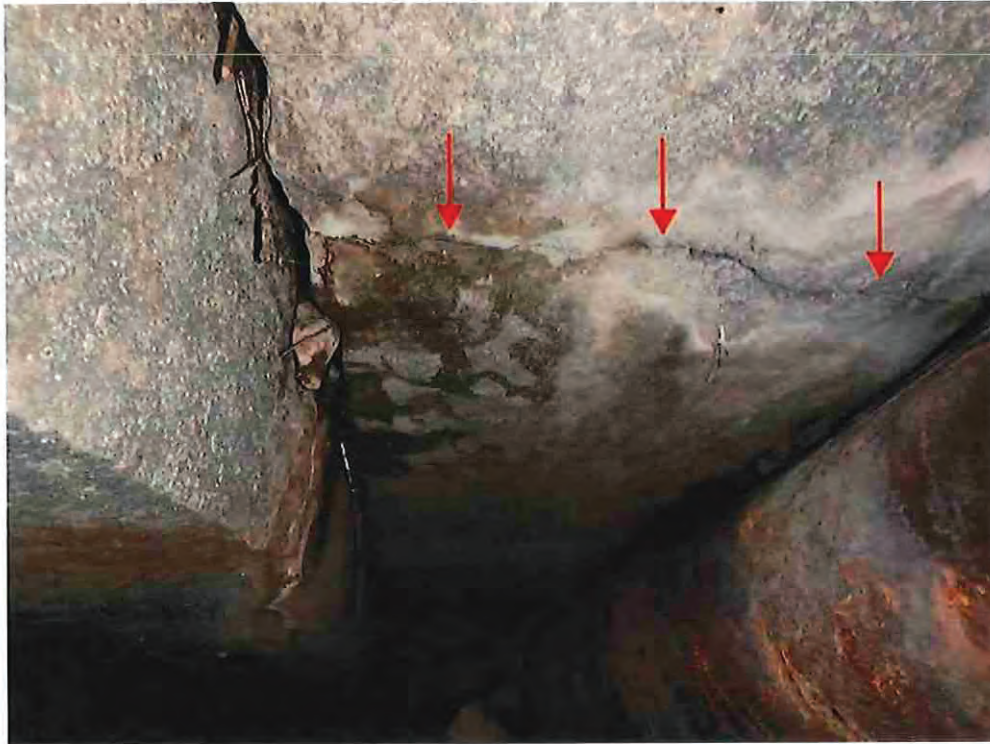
Girders/Beams - Span 1, Granite Slab #10, full width transverse hairline crack at midspan.
